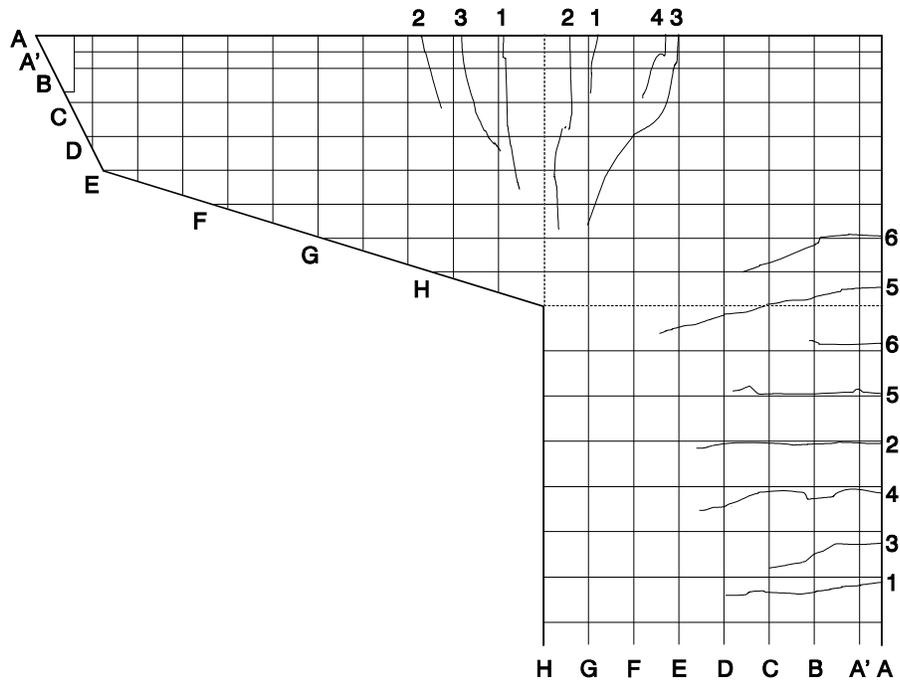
Cracking pattern on south face of Specimen POJ-PU-54-TH at service load
